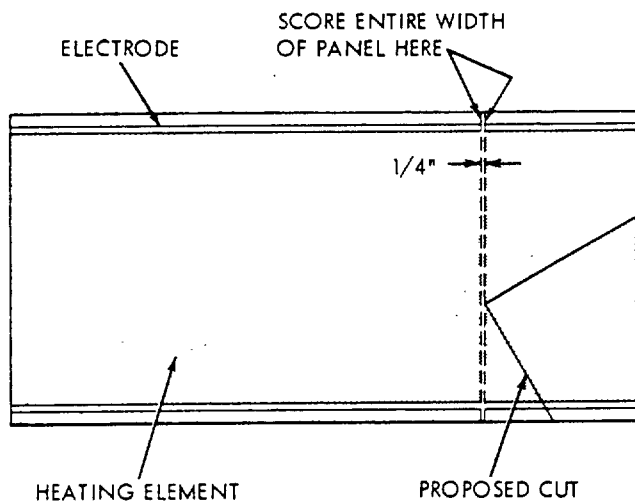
Cutting Heating Panel with Irregular Shaped End to Length
